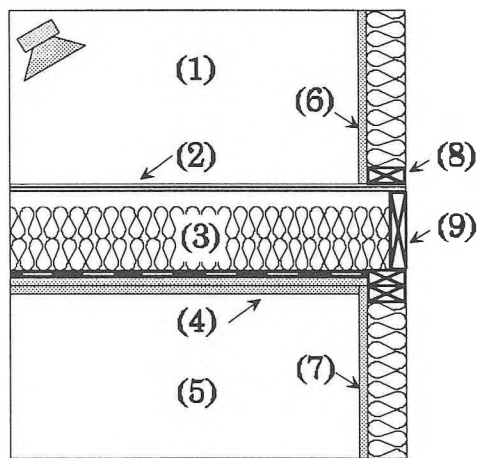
Section through the floor and load-bearing party walls. (1): source room, (2): 15.9 mm OSB decking, (3): 235 mm deep cavity with two layers of 89 mm batt insulation, (4): 2 layers 12.7 mm type X gypsum board mounted on resilient channels, (5): receive room, (6) and (7): 15.9 mm type X gypsum board, (8): 38x89 mm sole plate, (9): 38x235 mm joist header.
